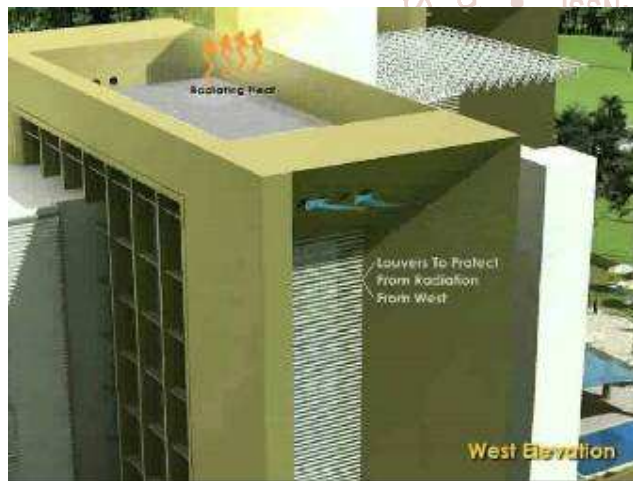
East west cross ventilation through louvered openings and Terrace top ventilated to remove heat
